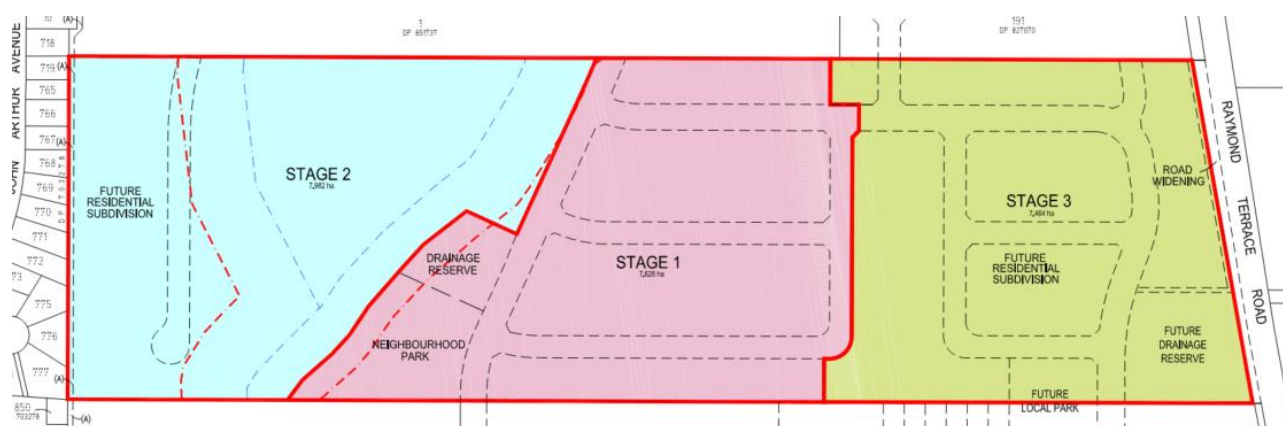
Approved Staging Plan (Stage 2 relates to the subject application)
